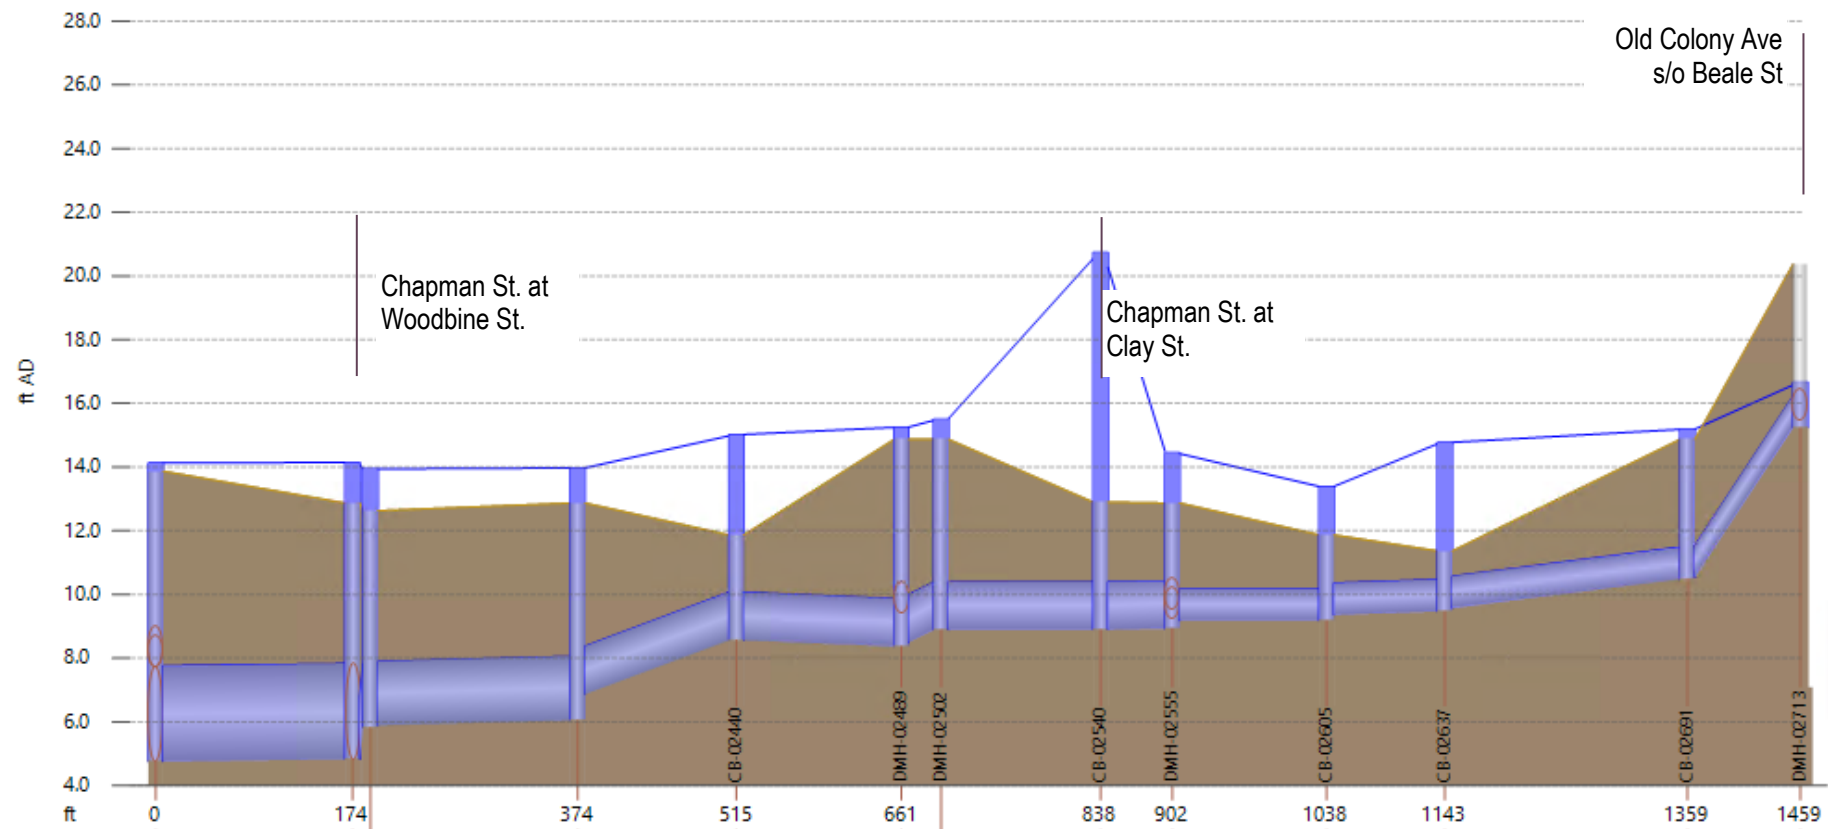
Drainage Line 10-yr Mean High Tide Hydraulic Grade Line: Old Colony Ave s/o Beale St. and Brook St. to Chapman and Woodbine St.
